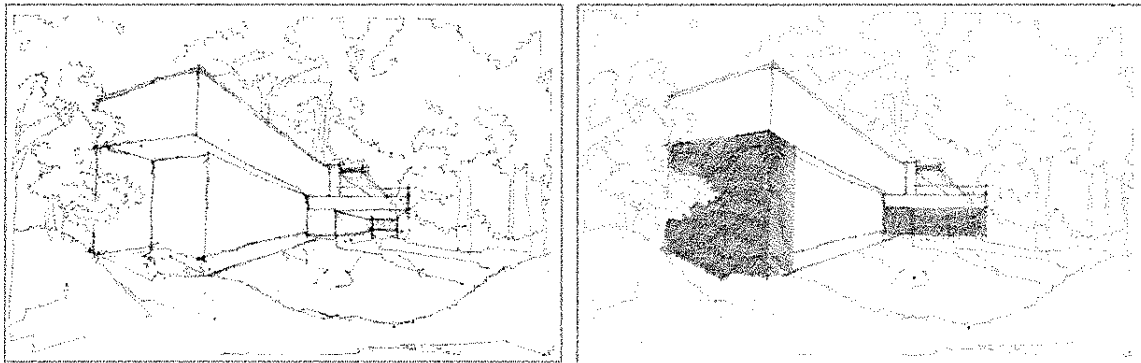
The sketch on the left illustrates the existing building with a cantilevered second storey. The sketch on the right shows an inappropriate alteration that fills in the void created by the cantilevered upper storey.
